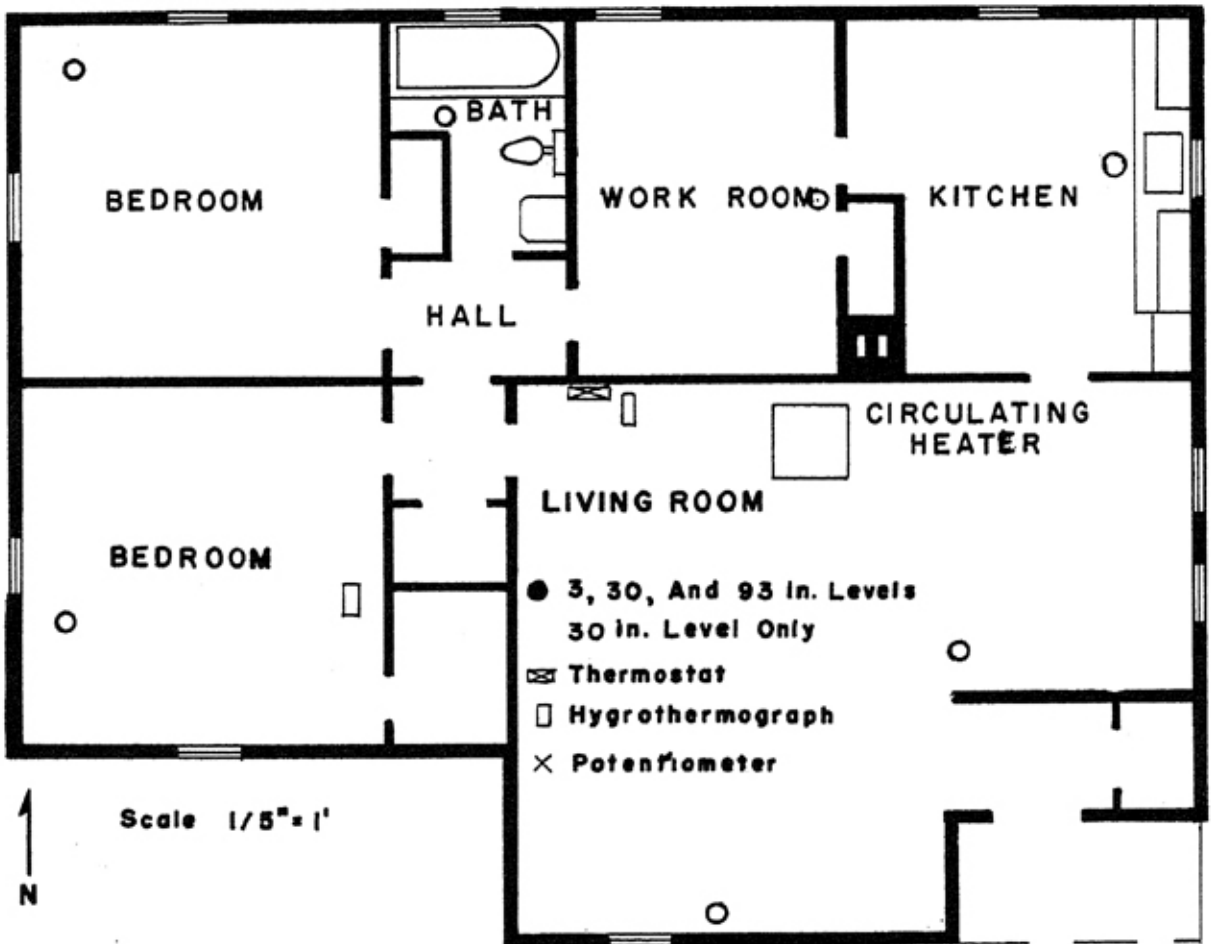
Floor plan of House No. 1 showing location of heater, thermocouples, and hygrothermographs.
